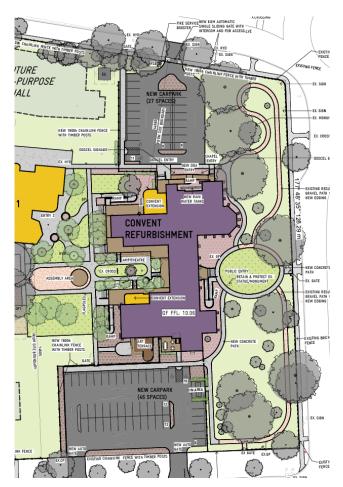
Extract of TP06 P1, proposed site plan showing the formal landscaping area east of the Convent building, and the altered north and south carparks. Source: Y2 Architecture, 2023.
